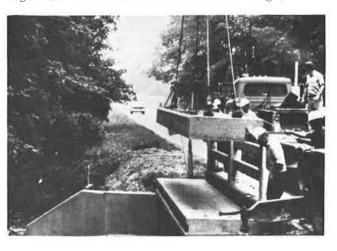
Precast slabs replace substandard steel stringer-timber deck superstructure.
